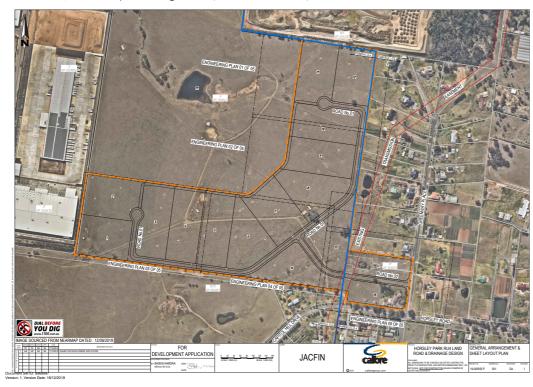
Jacfin Horsley Park Project - Horsley Park RU4 Land Road & Drainage Design (Source: Calibre)
